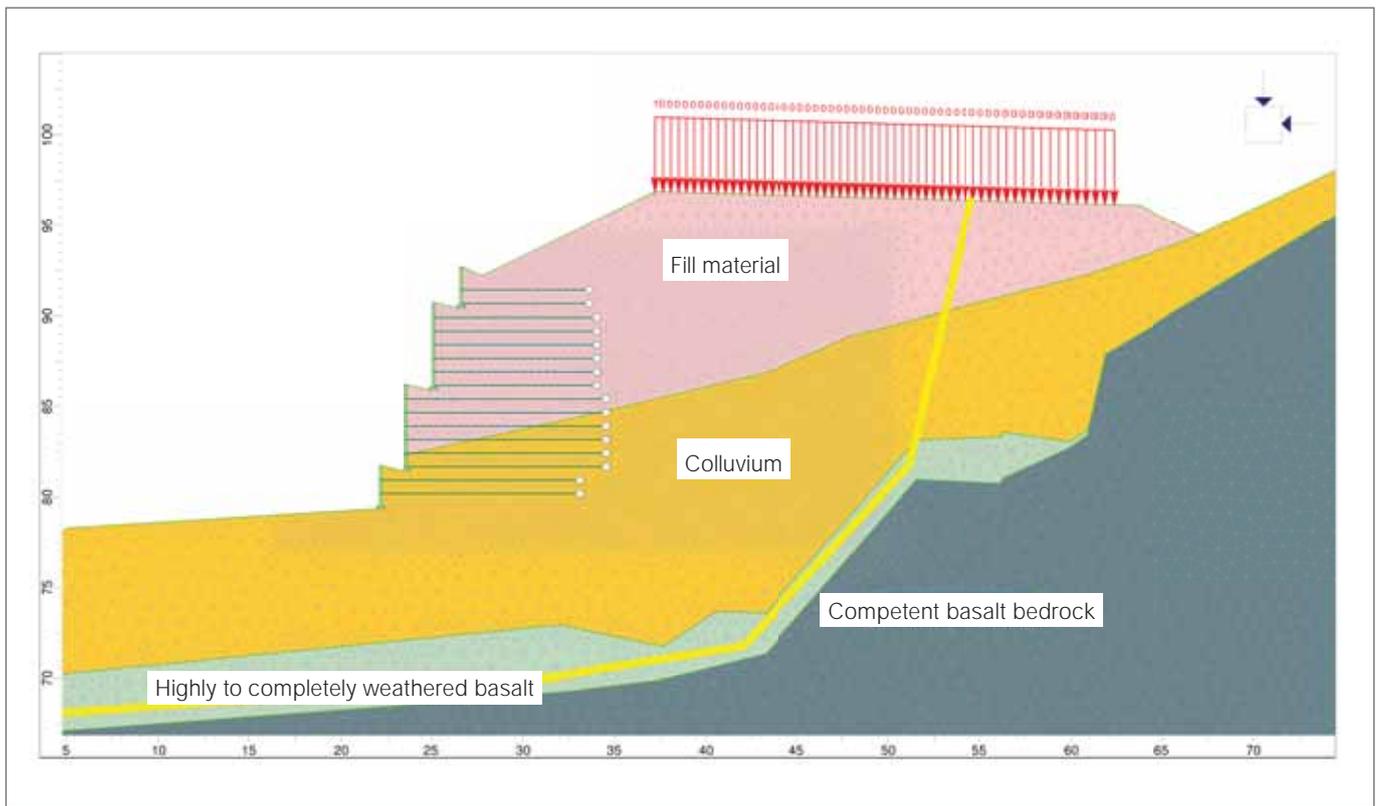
Cross section through mechanically stabilised earth fill prior to failure
